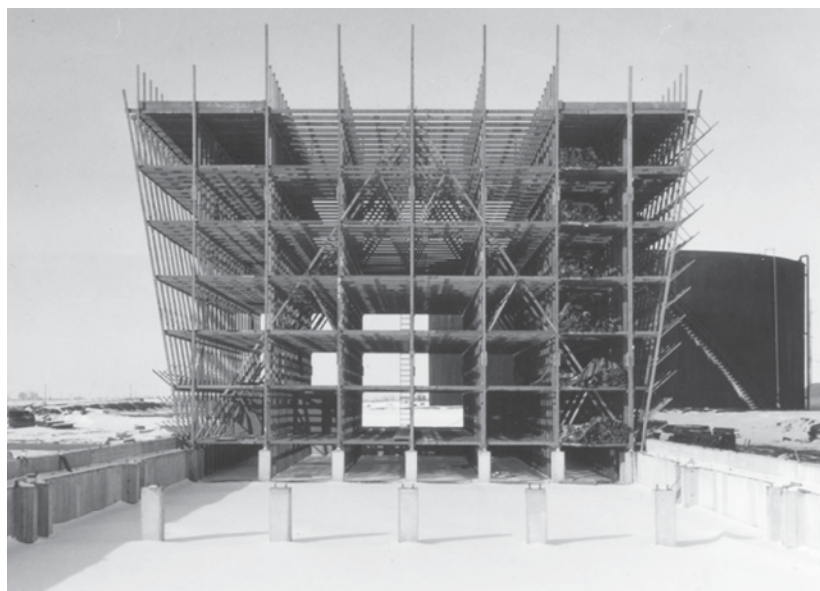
Crossflow tower framework on concrete basin prepared for future tower extension.
